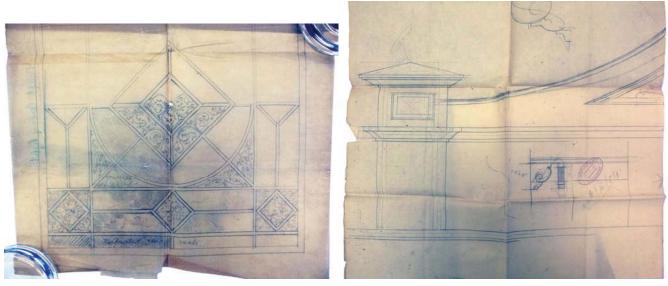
(left): Detail of the ceiling light, dated c1903 (CAC(B) Z/1028/1 c1903) Plate 71 (right): Moulding detail dated c1903 (CAC(B) Z/1028/1 c1903)
